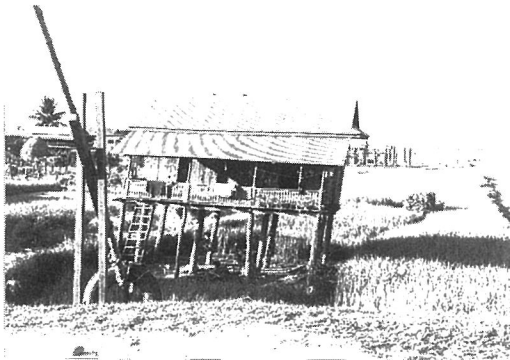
An undamaged rural wooden house; example 3, near Biratnagar, Nepal
